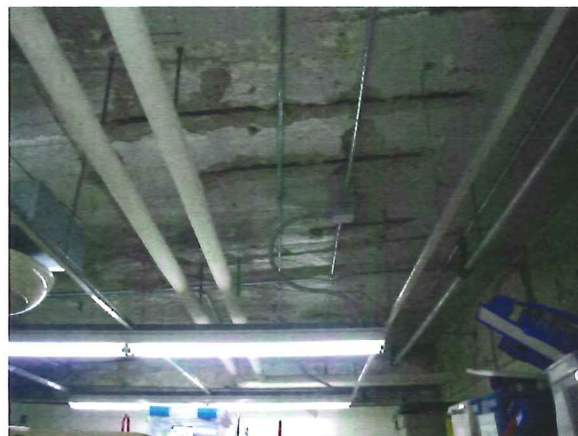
#113: Storage space under concrete flat area (grade) is significantly damaged to water and environmental containments penetrating into the space and damaging the structure. This space does not have floor space above it or grade. This area should be demolished.
